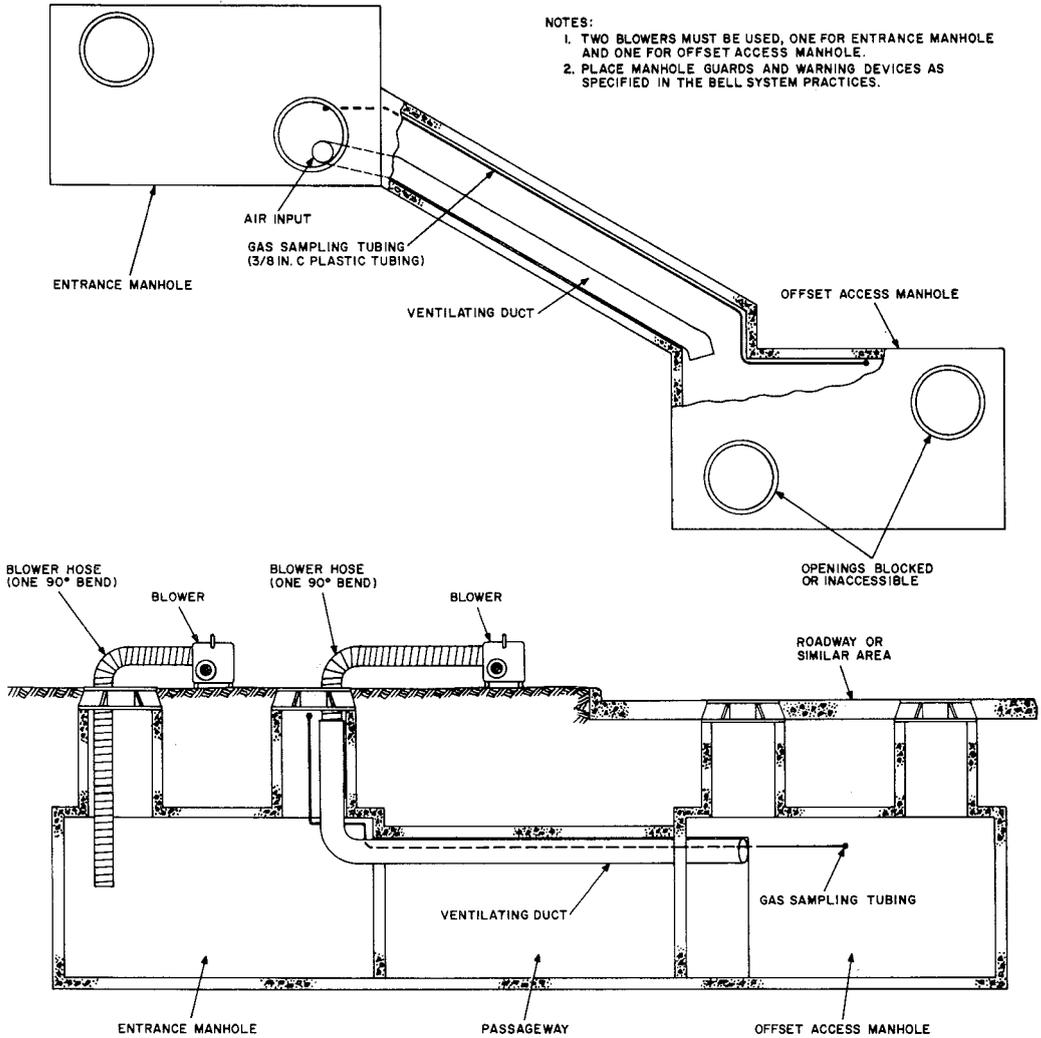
Typical Setup for Purging Offset Access Manhole With Entrance Manhole
